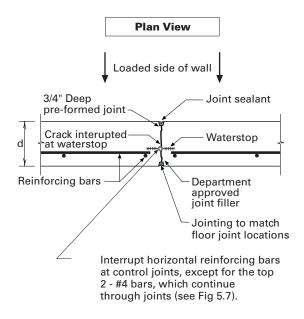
Wall sawn or formed control joint with waterstop at midpoint of wall (wet joint).
